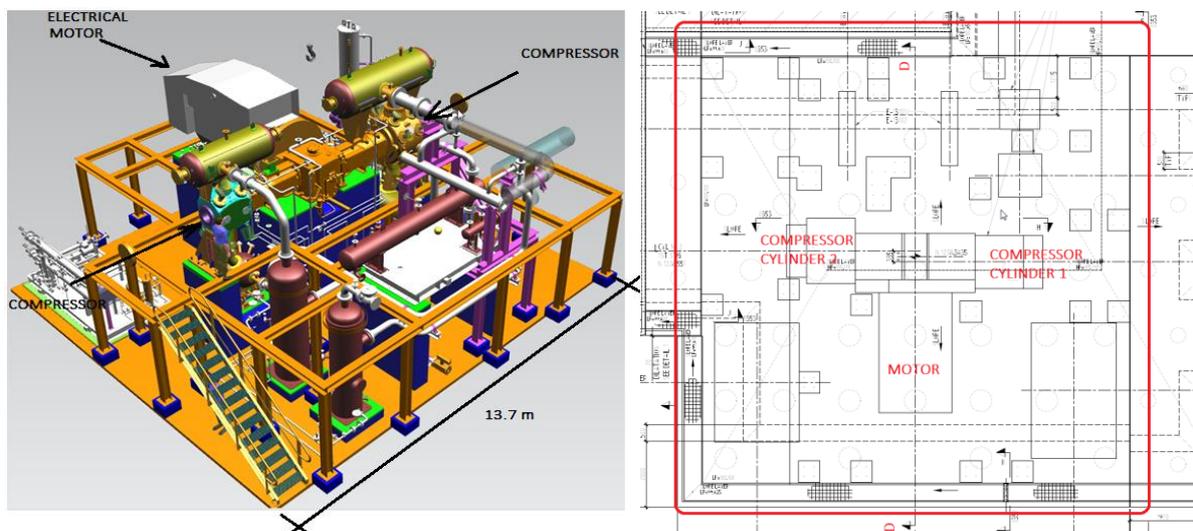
a) Layout arrangement – Reciprocating machine, Compressor – 3D View; b) Planview – Geometry definition of pile cap and equipment plinths
